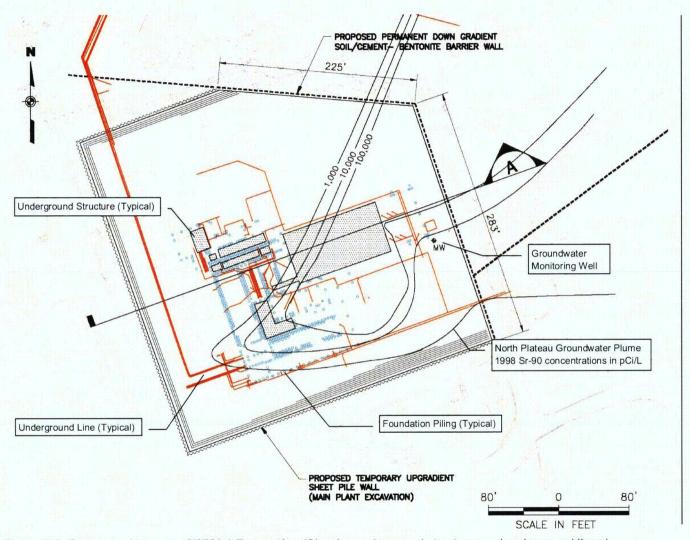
Conceptual Layout of WMA 1 Excavation (Showing underground structures and underground lines.)
